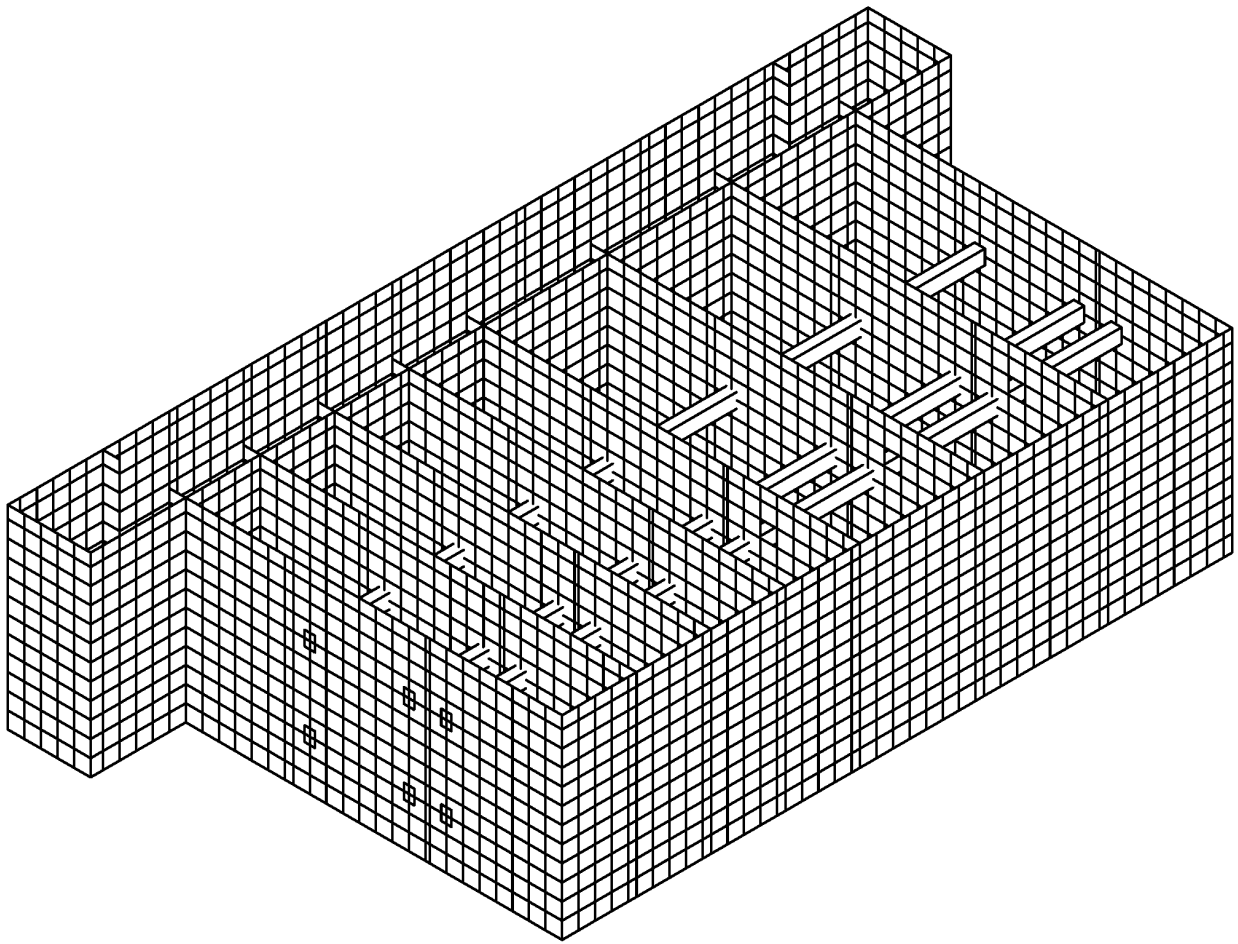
{Isometric Northeast View of the GT STRUDL Finite Element Model for the UHS Makeup Water Structure (partial view of basemat, exterior walls, interior divider walls and interior beams)}
